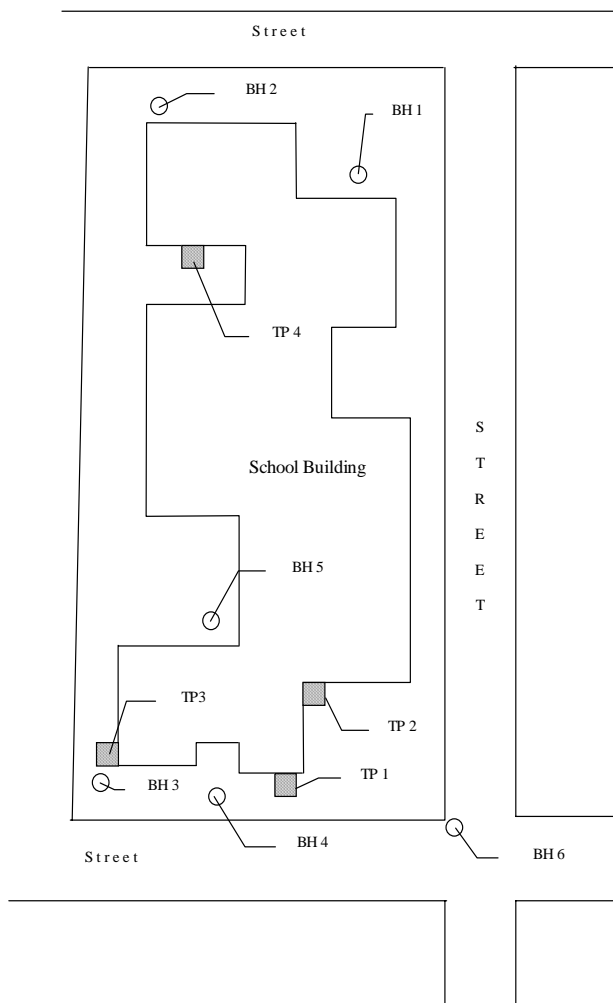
Plan for the school under study with locations of drilled bore holes and test pits.
